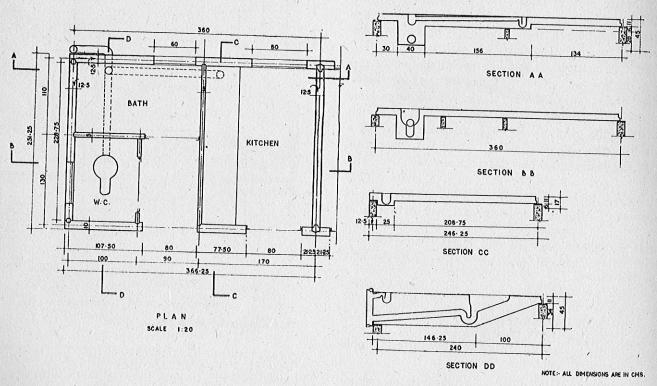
TYPICAL STANDARDIZED SERVICE FLOOR PANEL FOR LARGE PANEL HOUSE C. B.R.I. ROORKEE
